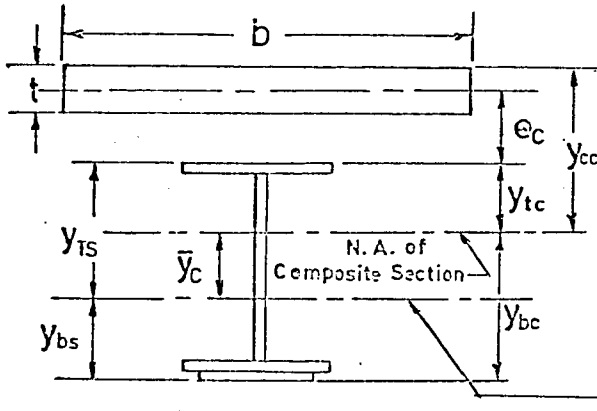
COMPOSITE BEAM SECTION (N.A. BELOW SLAB)
